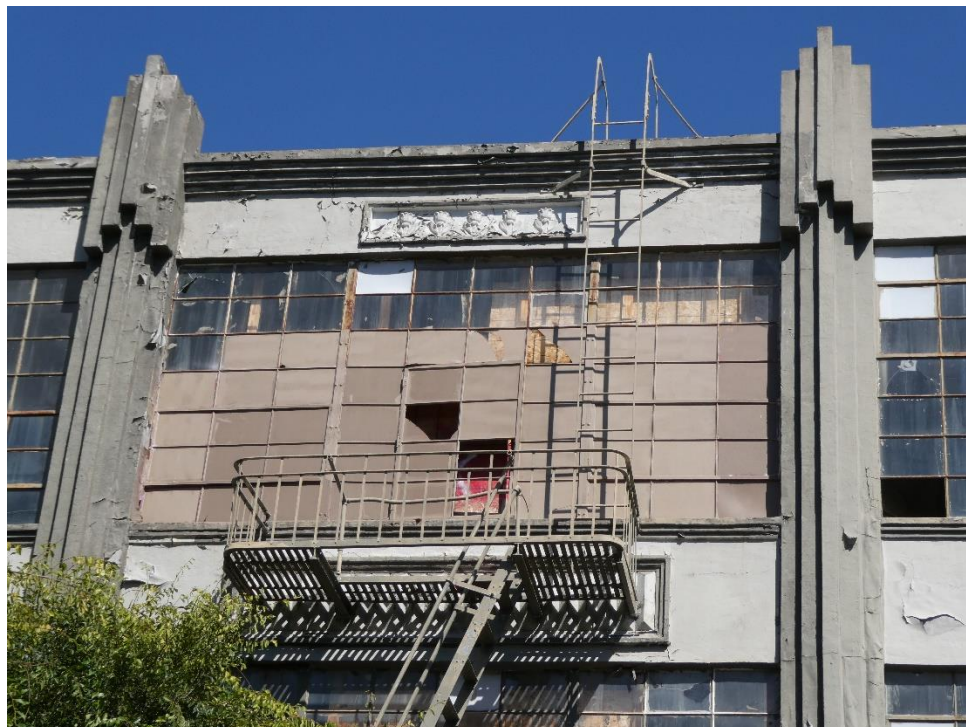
Additional broken and cracked panes at west façade. (Page & Turnbull, 2024)
